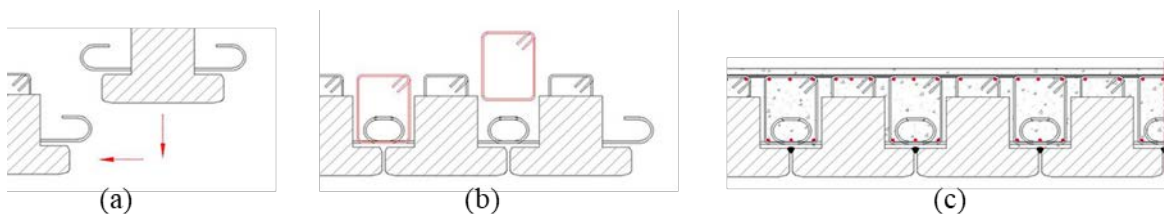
Construction sequence for Poutre-Dalle System: (a) adjacent placement of beams, (b) installation of joint reinforcement, (c) installation of remaining reinforcement and simultaneous casting of deck and joint [9]
